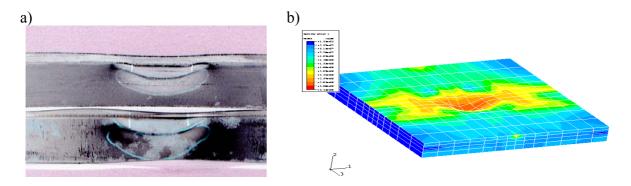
2 – core web plate plastic collapse: a) inside a panel, b) top view of a damaged sandwich panel predicted numerically.
